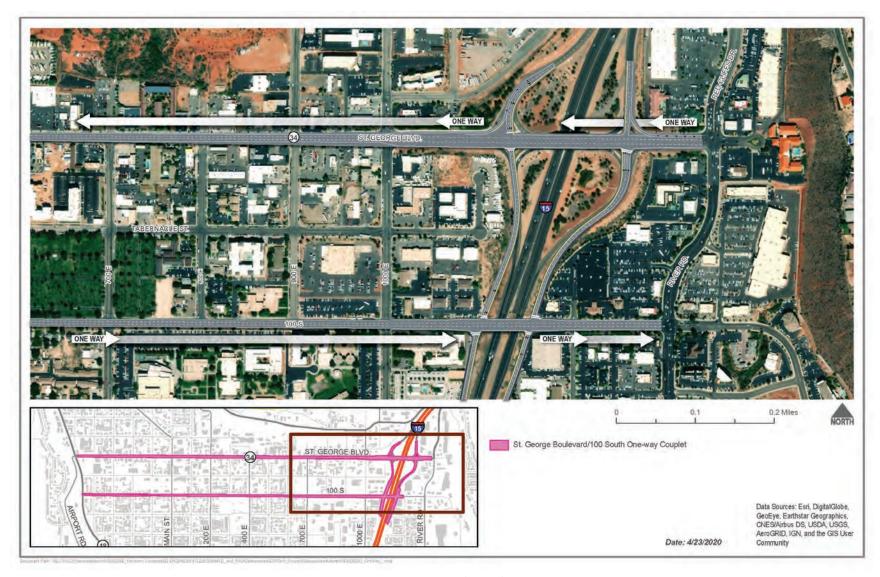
St. George Boulevard/100 South One-way Couplet Plan View (3 of 4)
